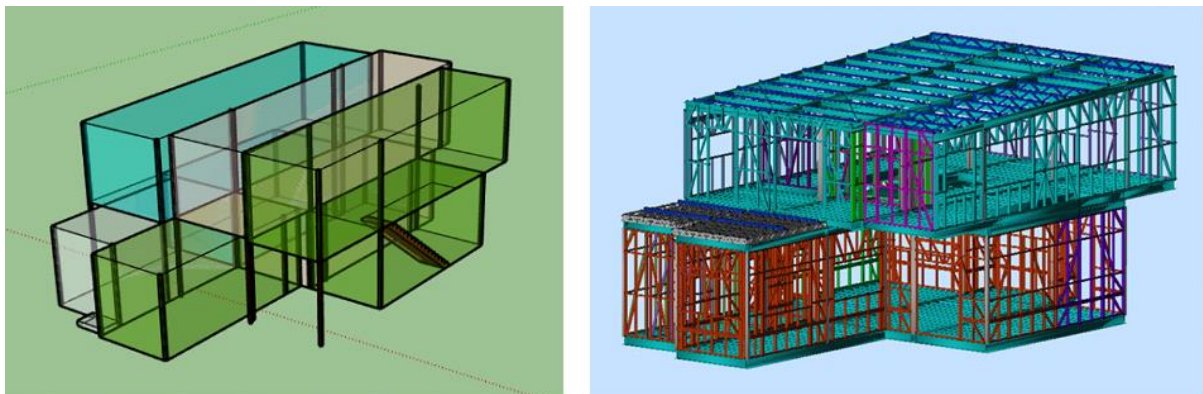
(a) The starting point for the project was the reused structural steel frames. (b) The steel frames reimaged in Framemad software.
